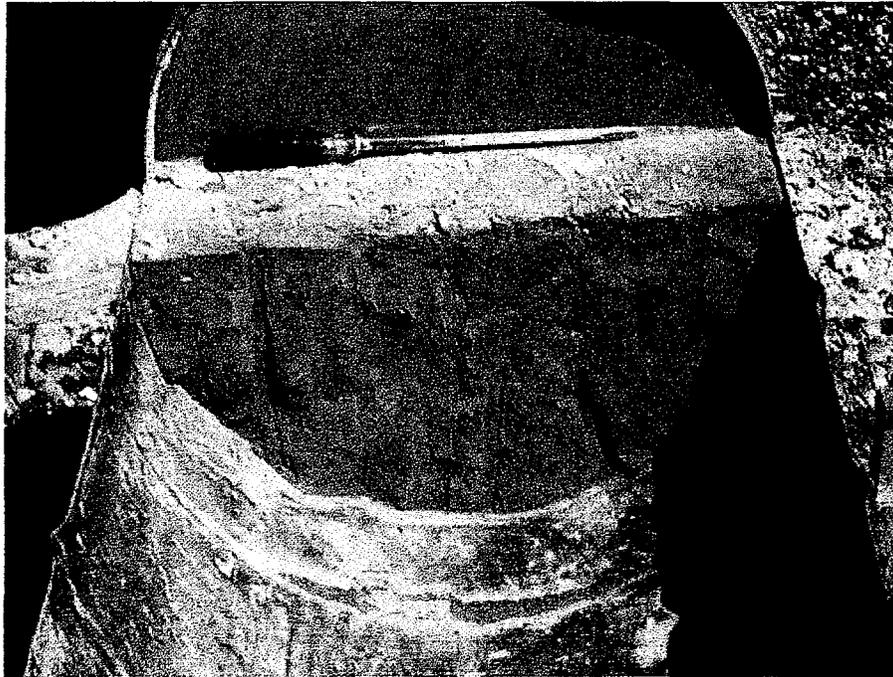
Grout Removed to ~12 in. from Drum End in Test 2. Grout appears uniform.
